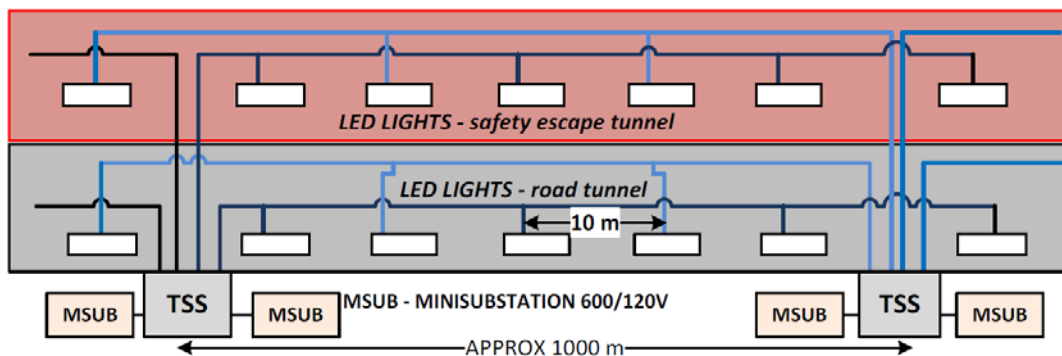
Road Tunnel Power Distribution - Typical Section
